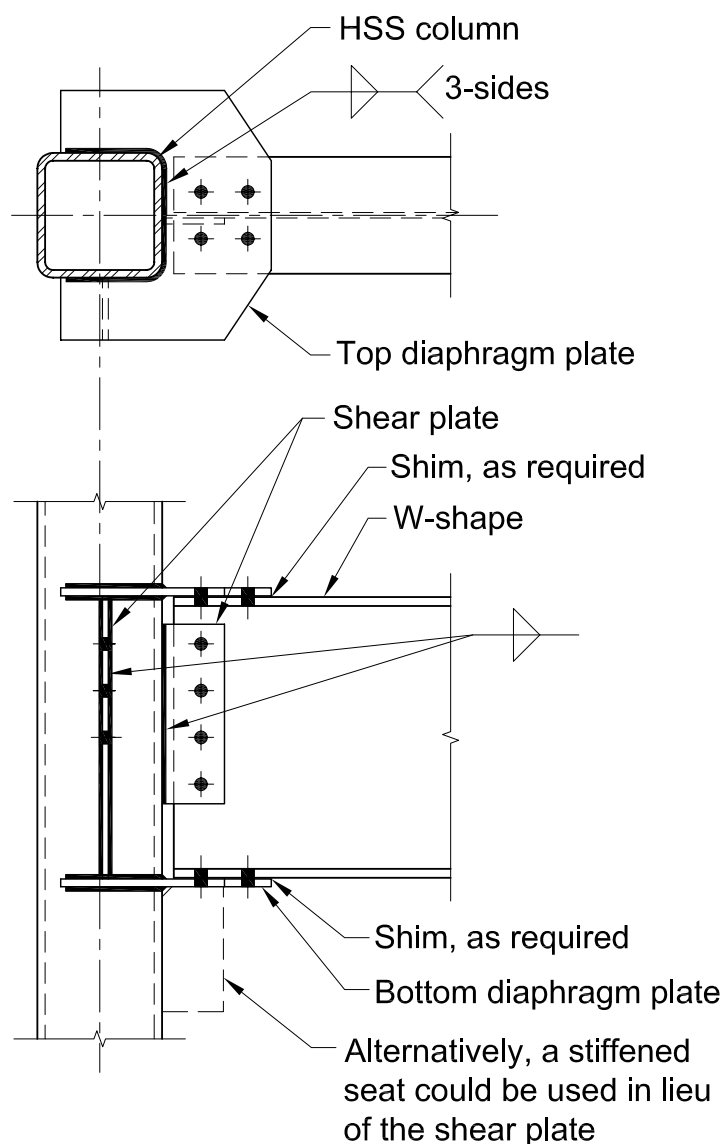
Diaphragm plate splice to exterior HSS column.
